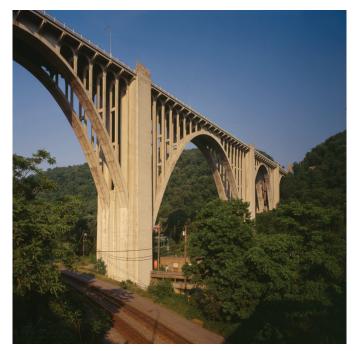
George Westinghouse Bridge: HAER collection* (Cridlebaugh, 2014).
